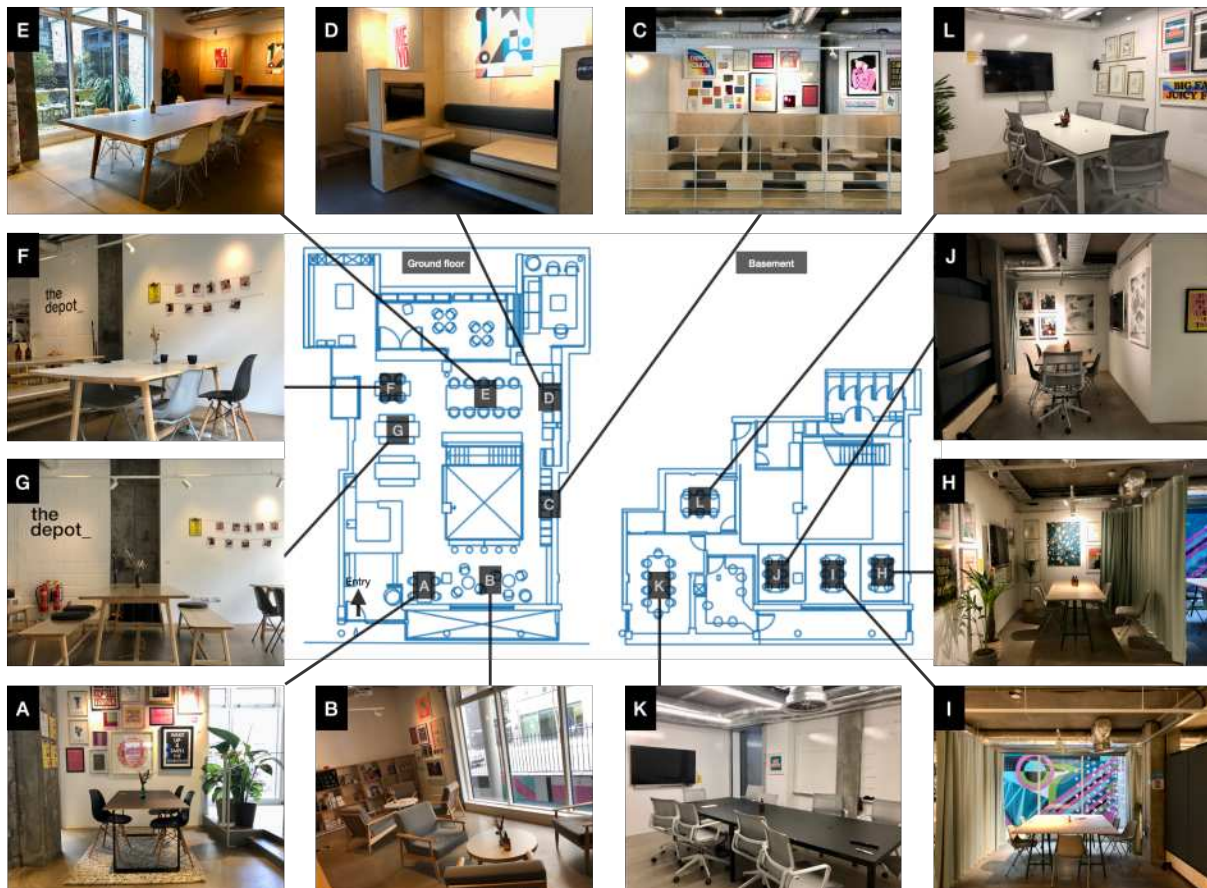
Case study, the depot_ (18 Wenlock Road, London N1 7TA): Plan, layout and photos of workspace
